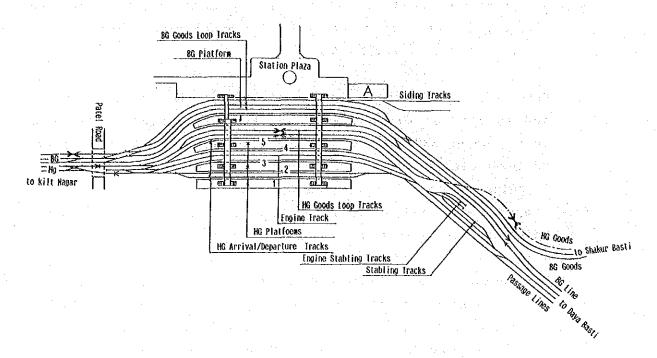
Conceptual Plan of Patel Nagar Terminal Track Layout
